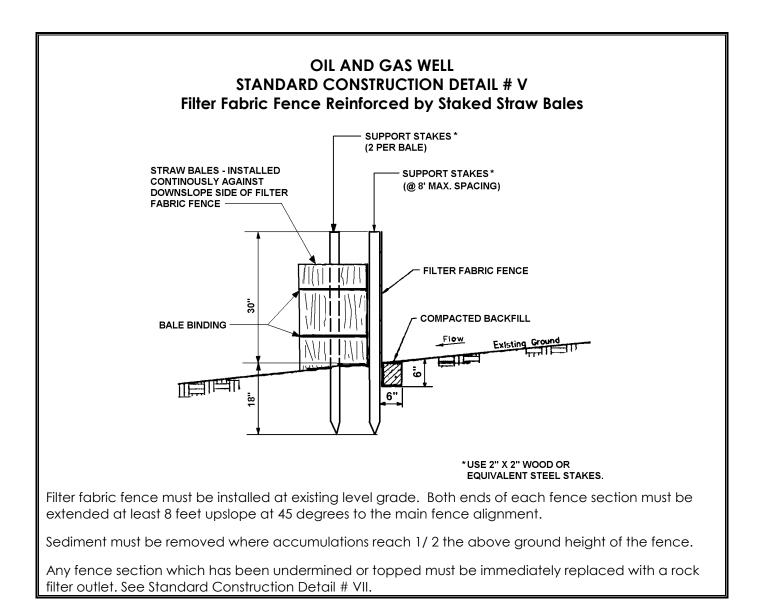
Sediment Barrier Installation at Existing Level Grade
